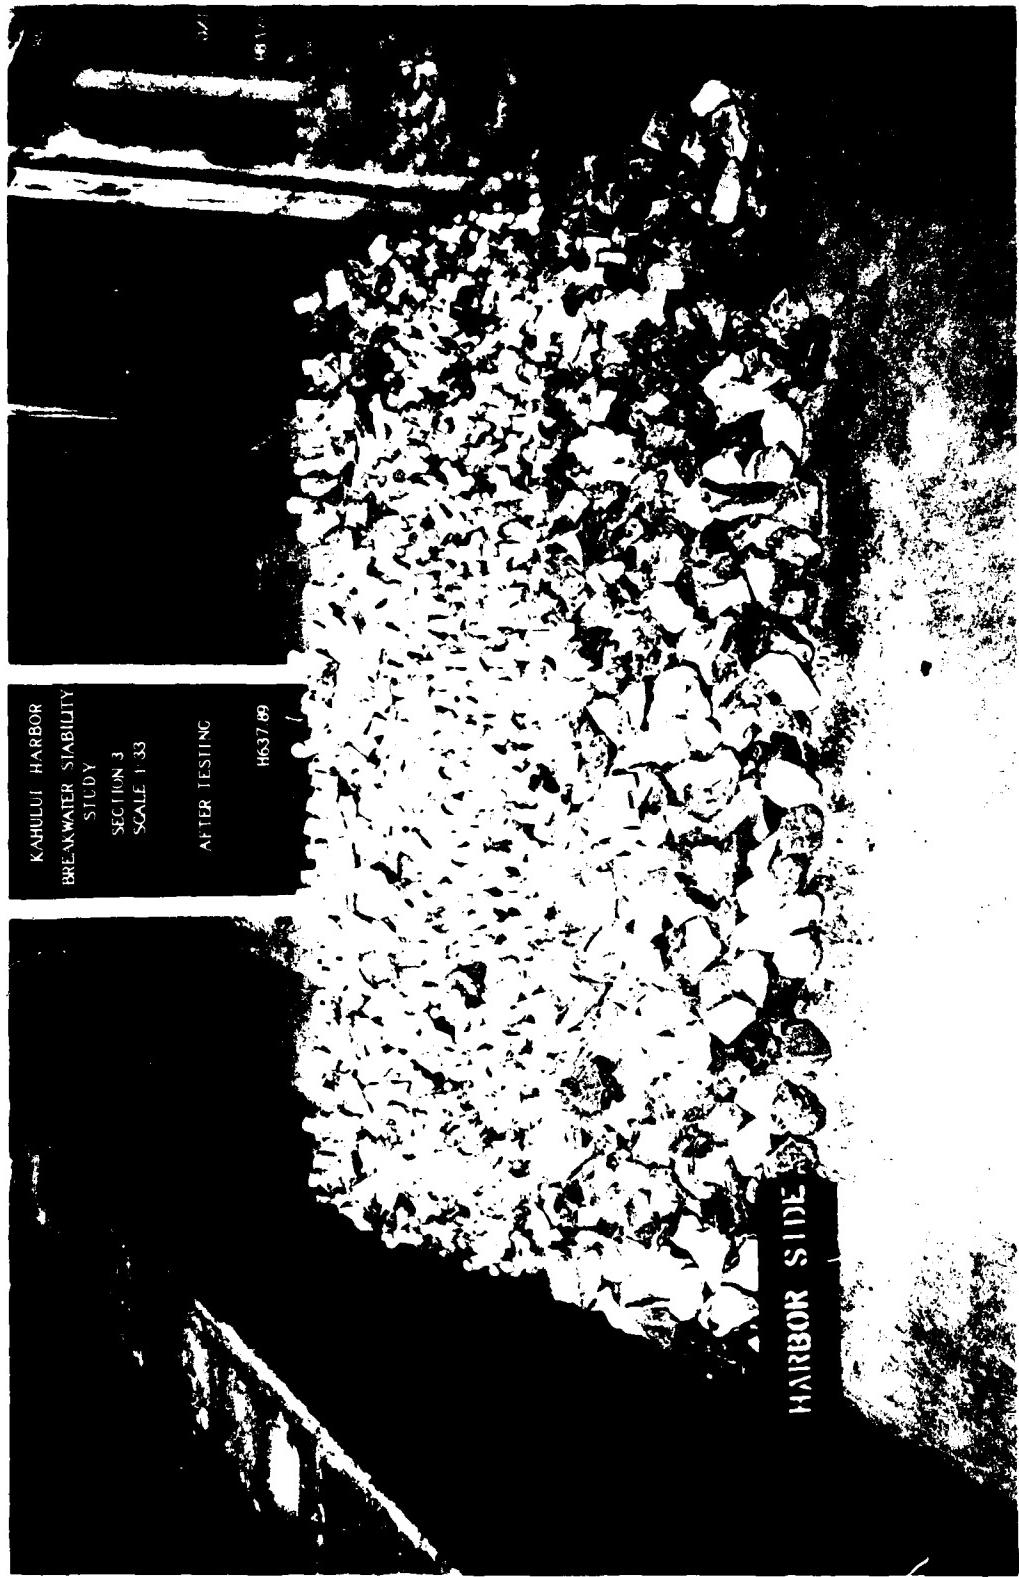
Harbor-side view of Plan 2 after testing, 2nd test
